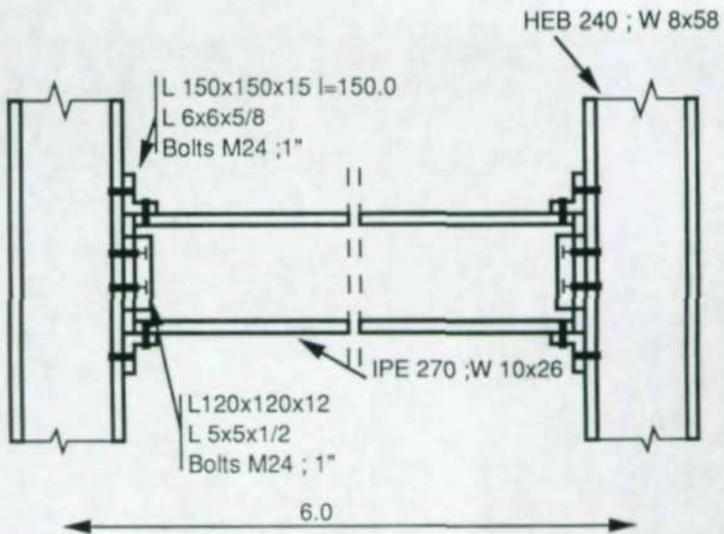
Braced Frame Beam with Semi-Rigid Connections
